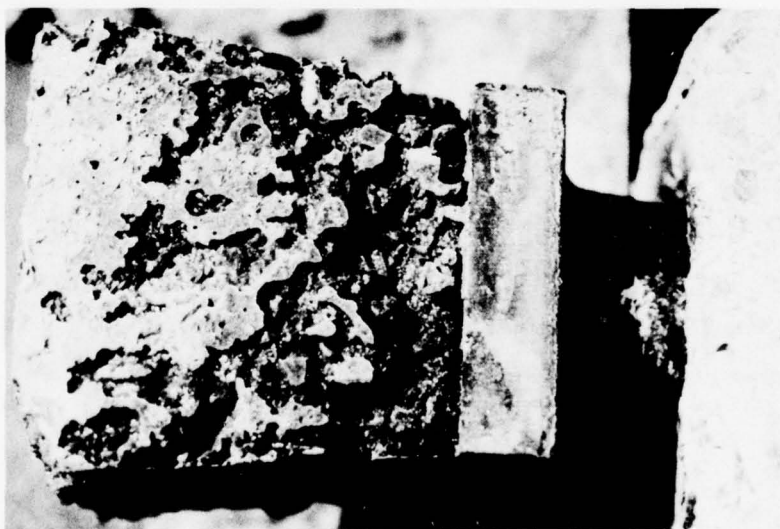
Poor compaction of the epoxy concrete end anchorage protection at the landward end of beam 11
